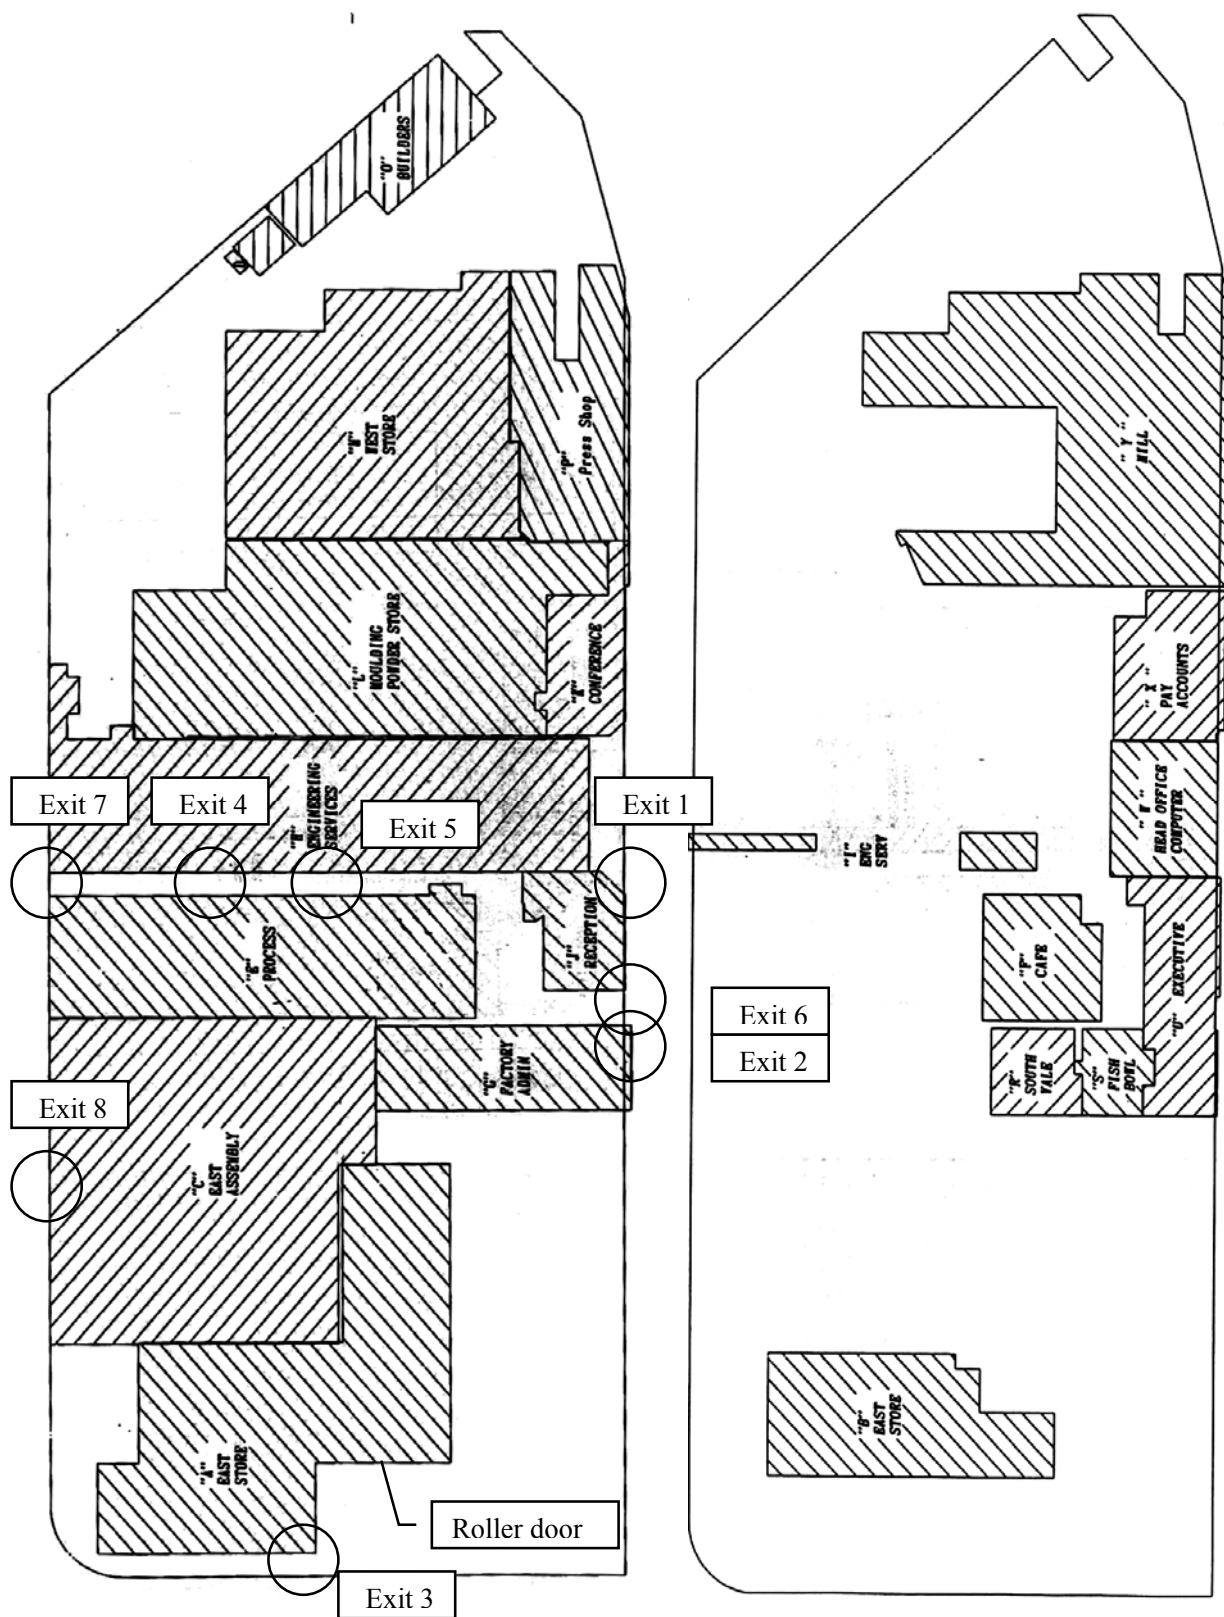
Plan View of the PDL Industries - Ground floor (left) and First floor (right)
